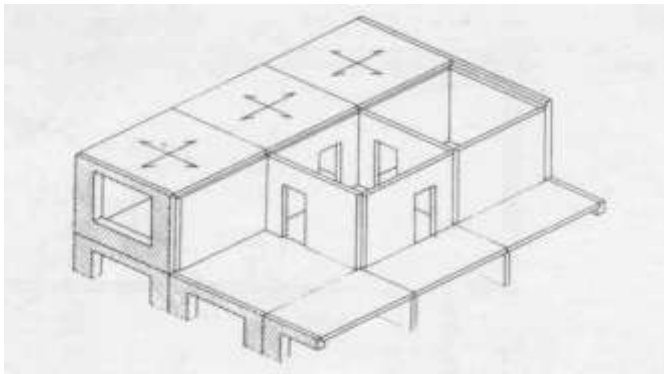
Diagram of the “classic” arrangement in a large-panel two-way span system building
